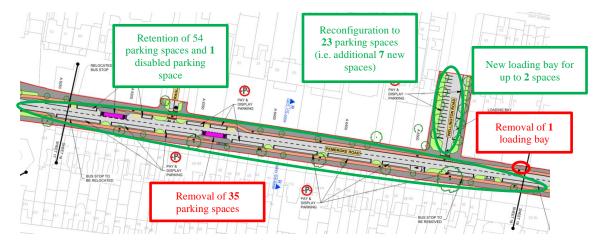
Proposed scheme design on Pembroke Road (including Wellington Road)
